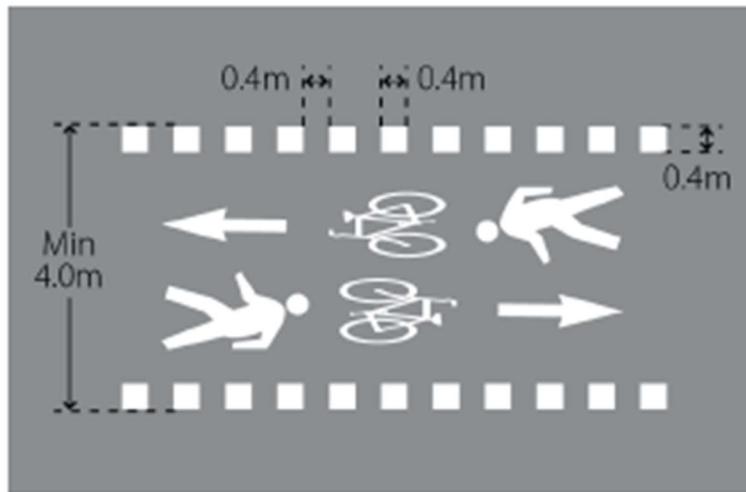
Pavement Markings for a Shared Crosswalk (Ministry of Transportation, 2000)
